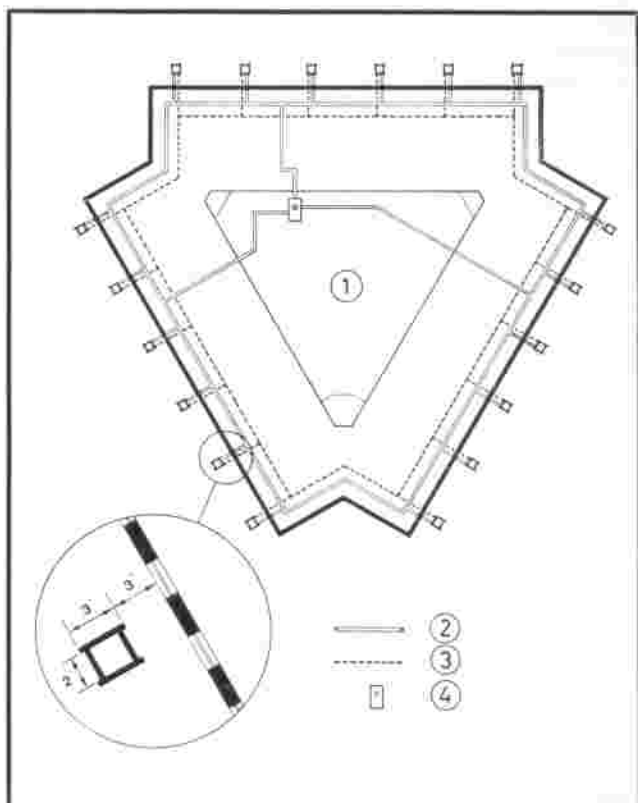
USS Building, Pittsburgh. Plan showing arrangement for water cooling of external steelwork
